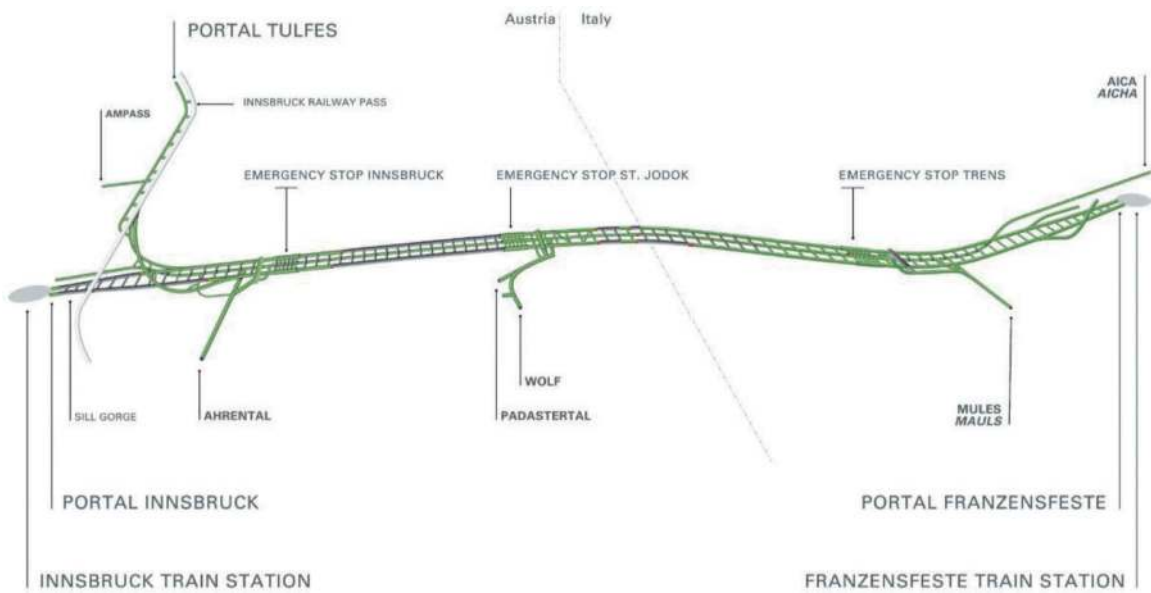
3D plan of the Brenner Base Tunnel with construction progress.
